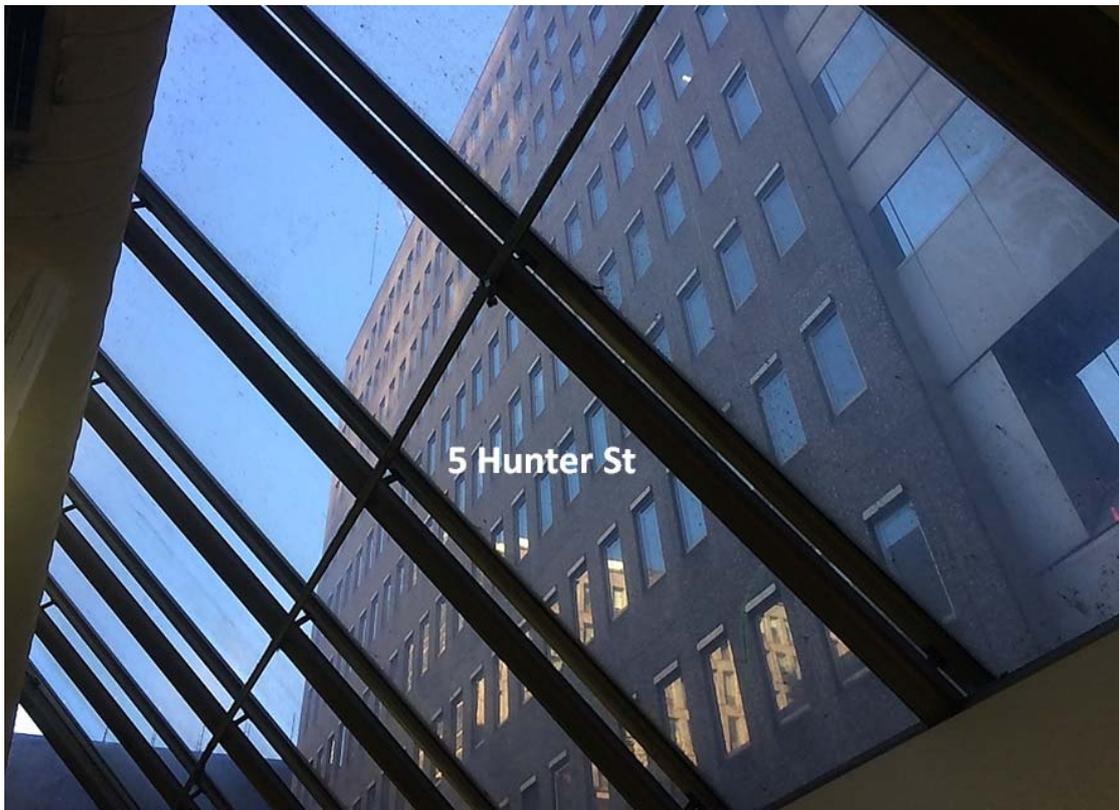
Existing right of way adjacent to the site's southern boundary.
